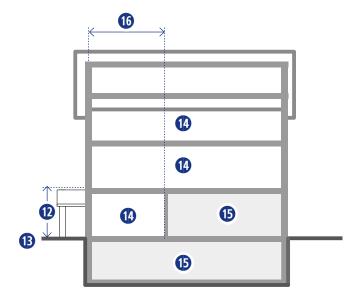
Detached House Building: Floor-to-Floor Height & Use Requirements
